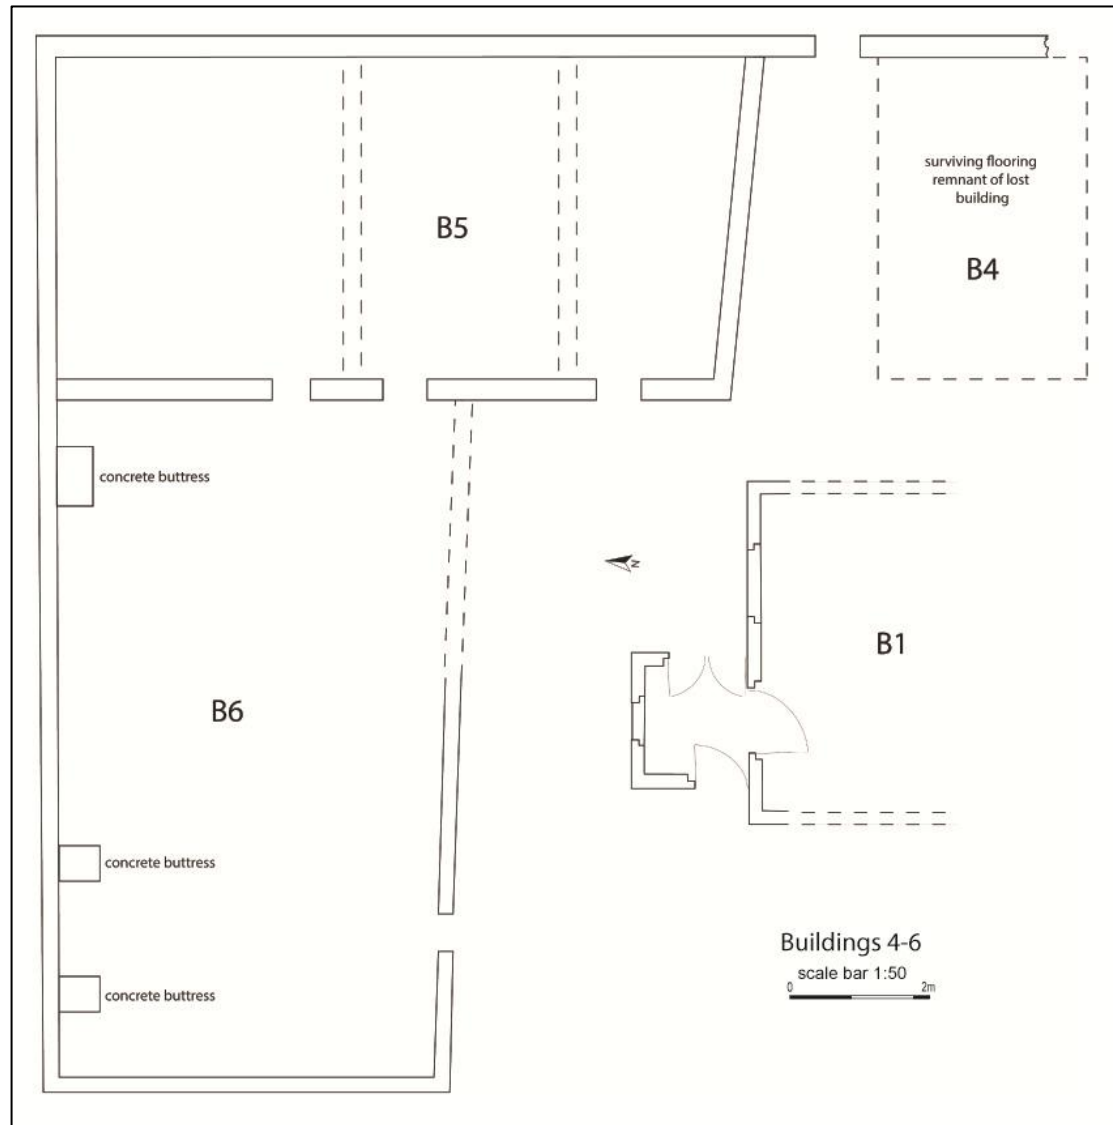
PLAN OF THE RUINED OUTBUILDINGS, B4-6.
